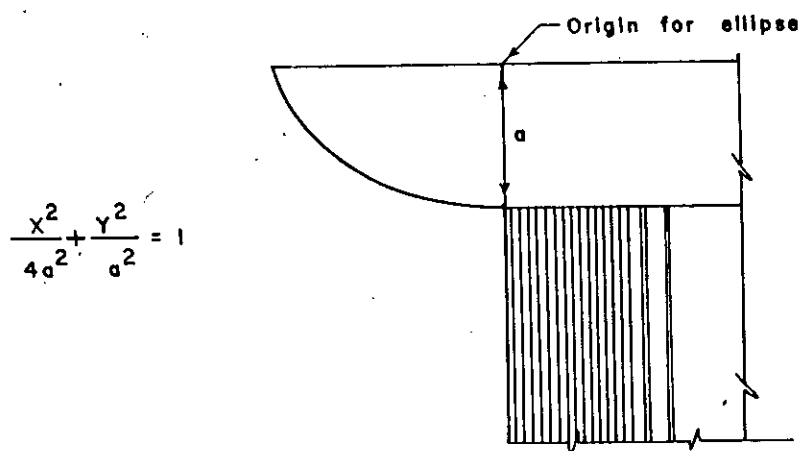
PROJECTED TOP SLAB OF TUNNELS
